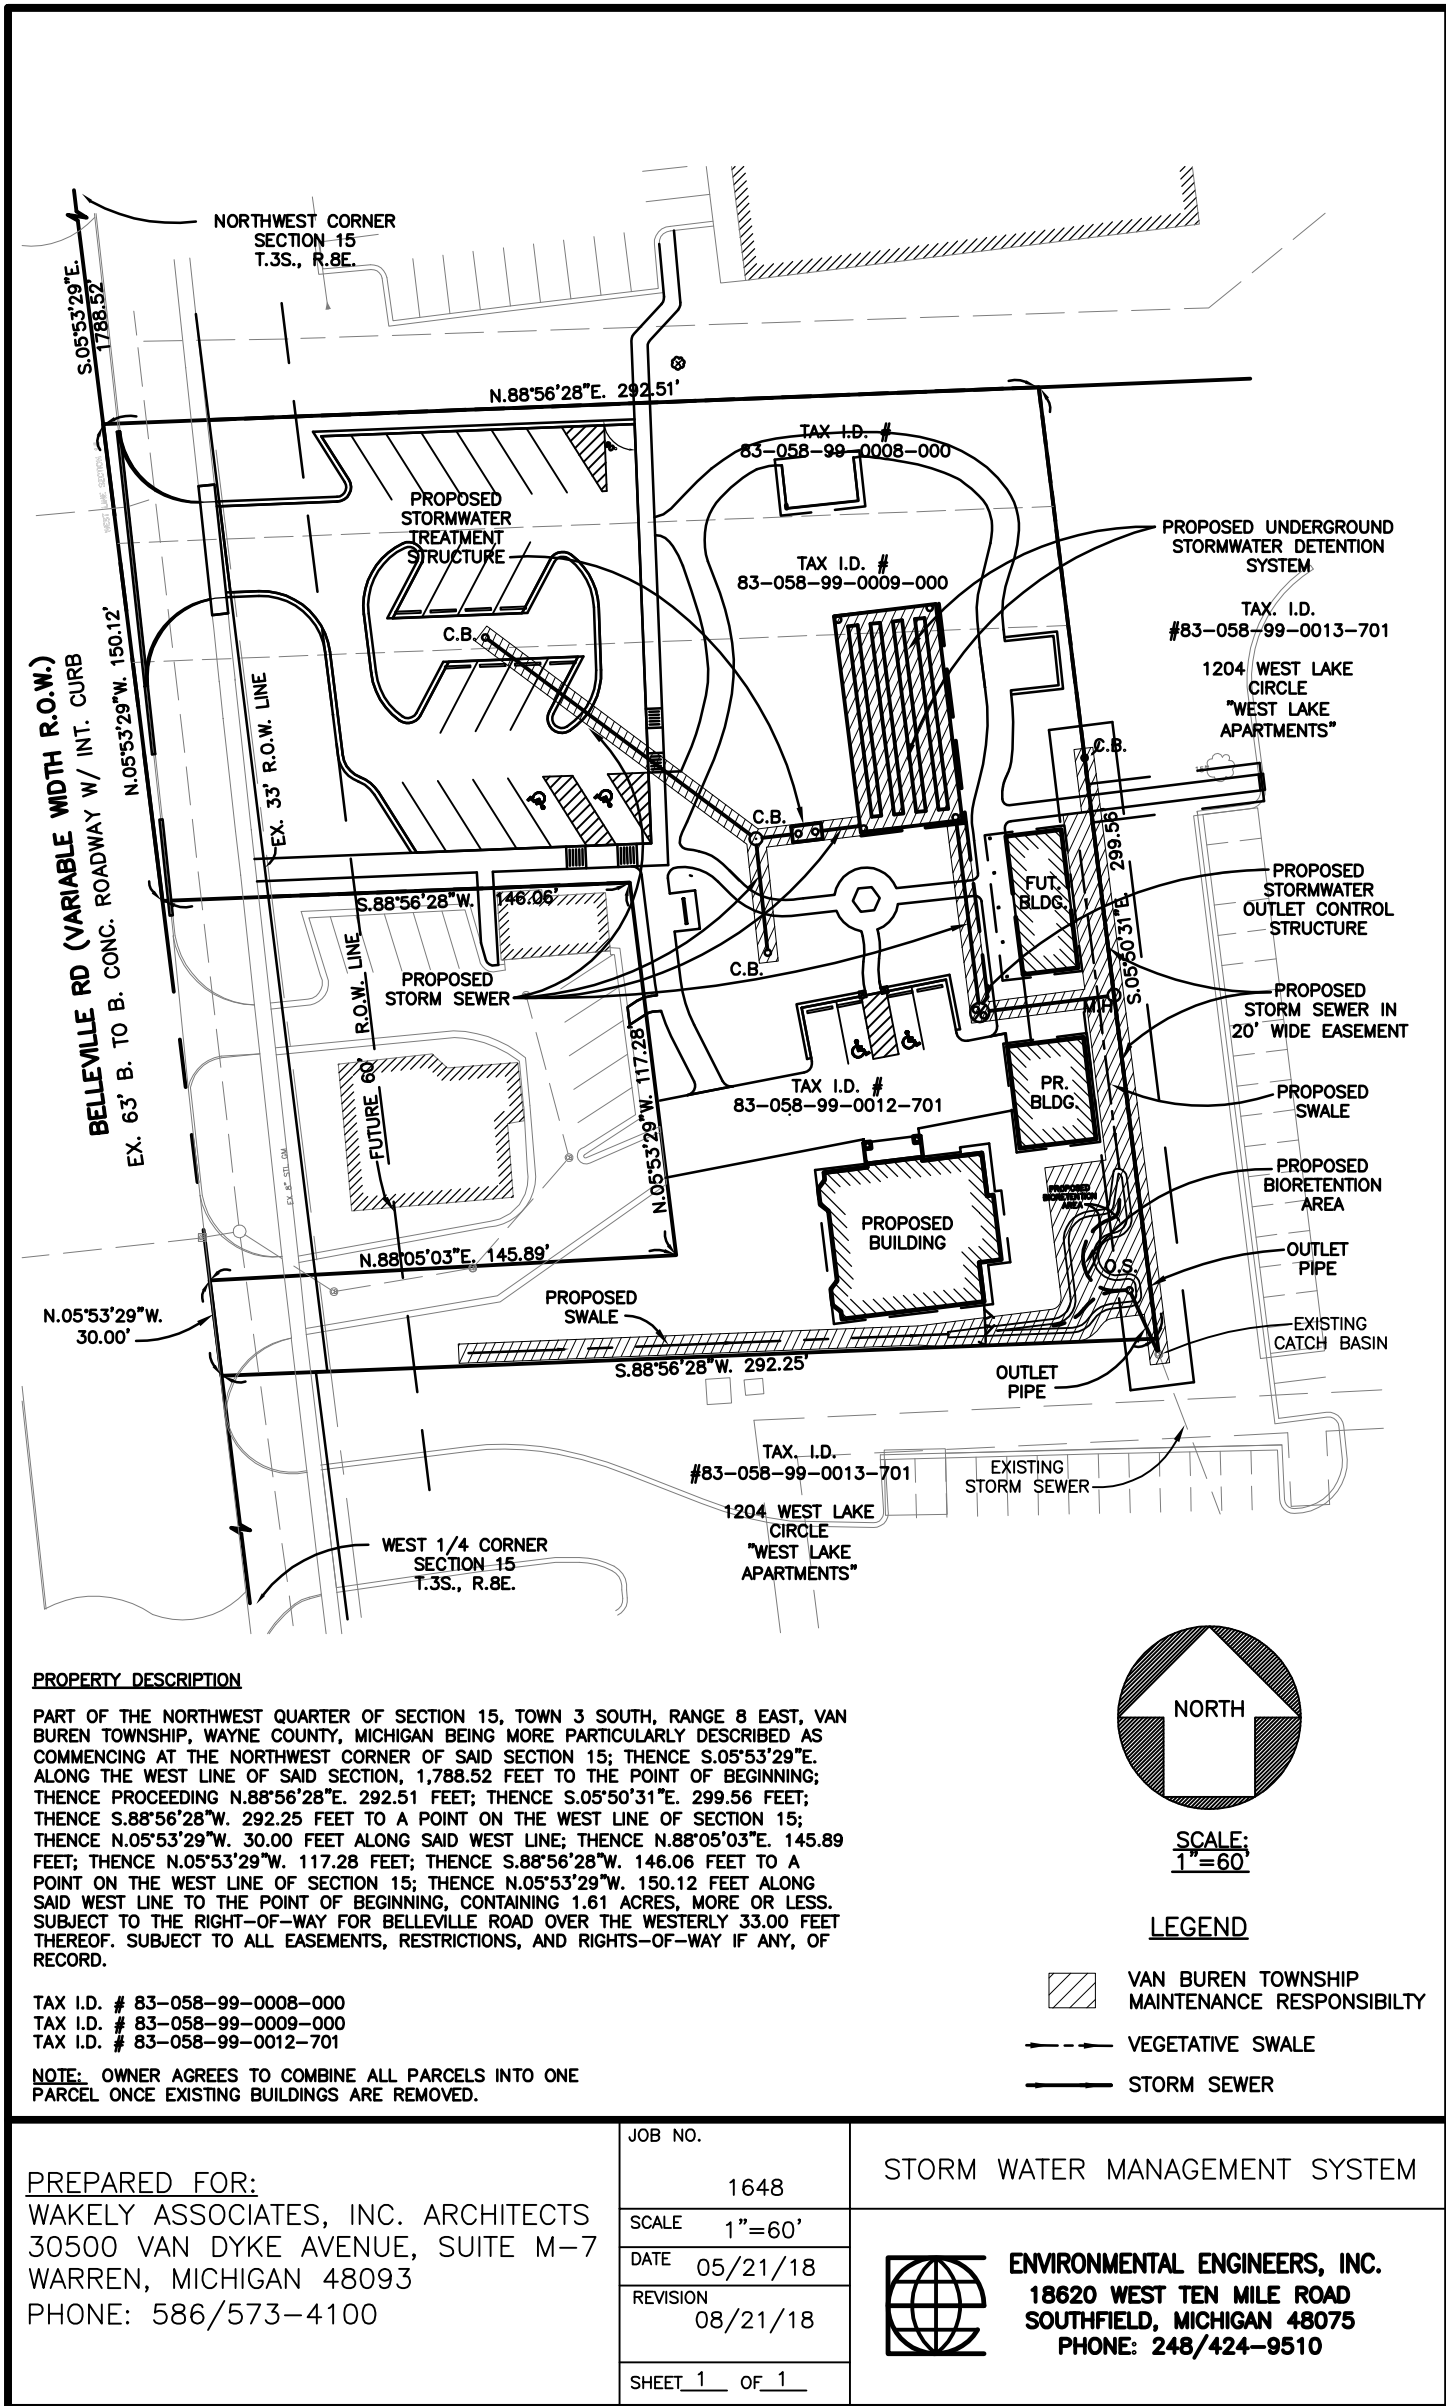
EXHIBIT B STORM WATER MANAGEMENT SYSTEM LONG-TERM MAINTENANCE PLAN
